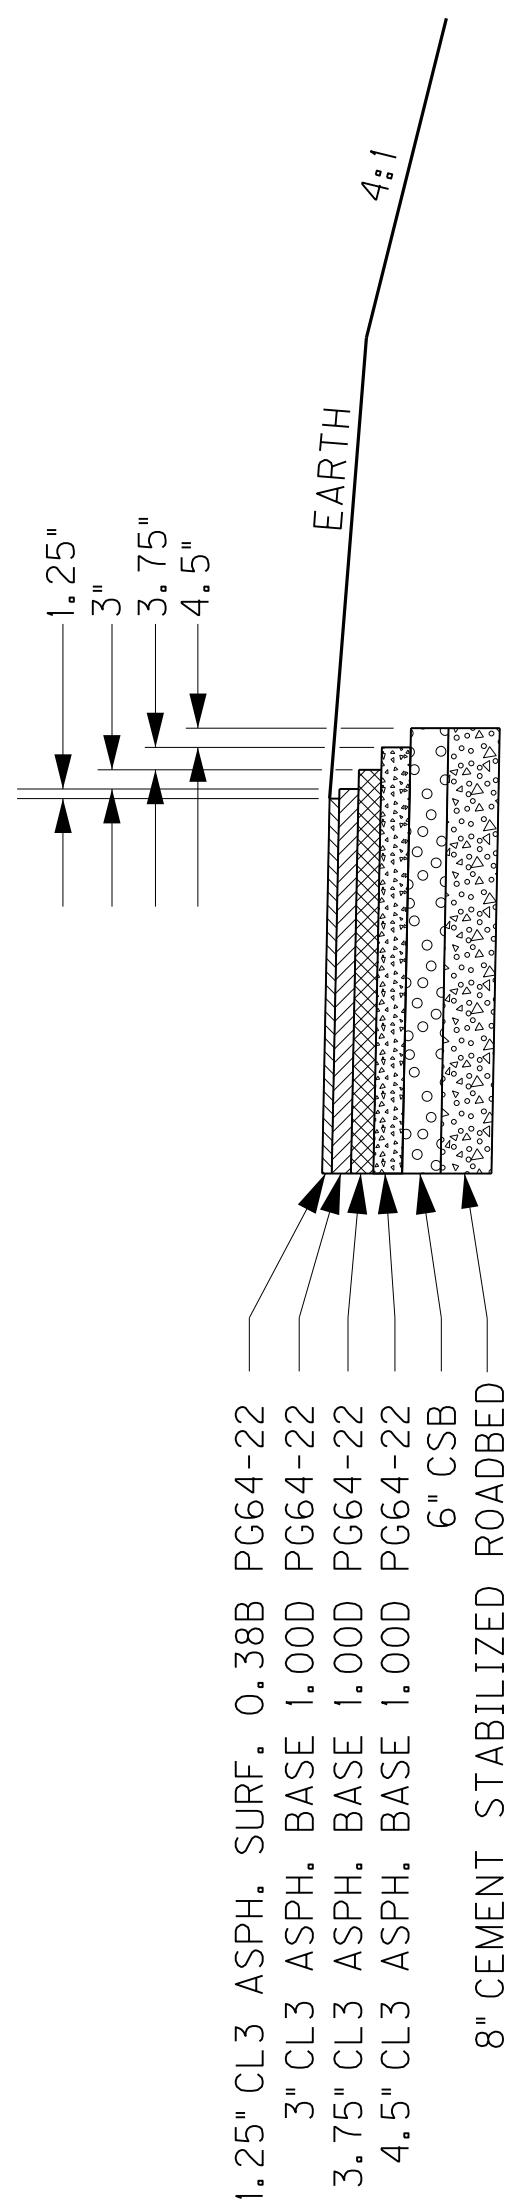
## DETAIL "C" FULL DEPTH PAVED RURAL SHOULDER N.T.S.
